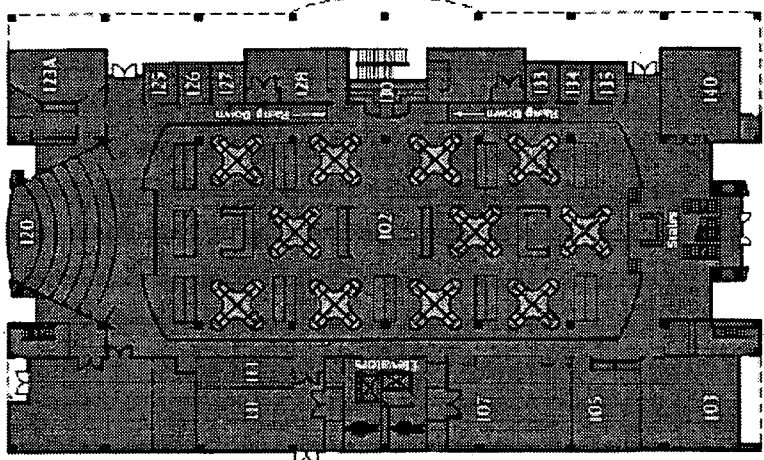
Floor plan for High Tech Centre #1, Glendale Community College, Arizona.
